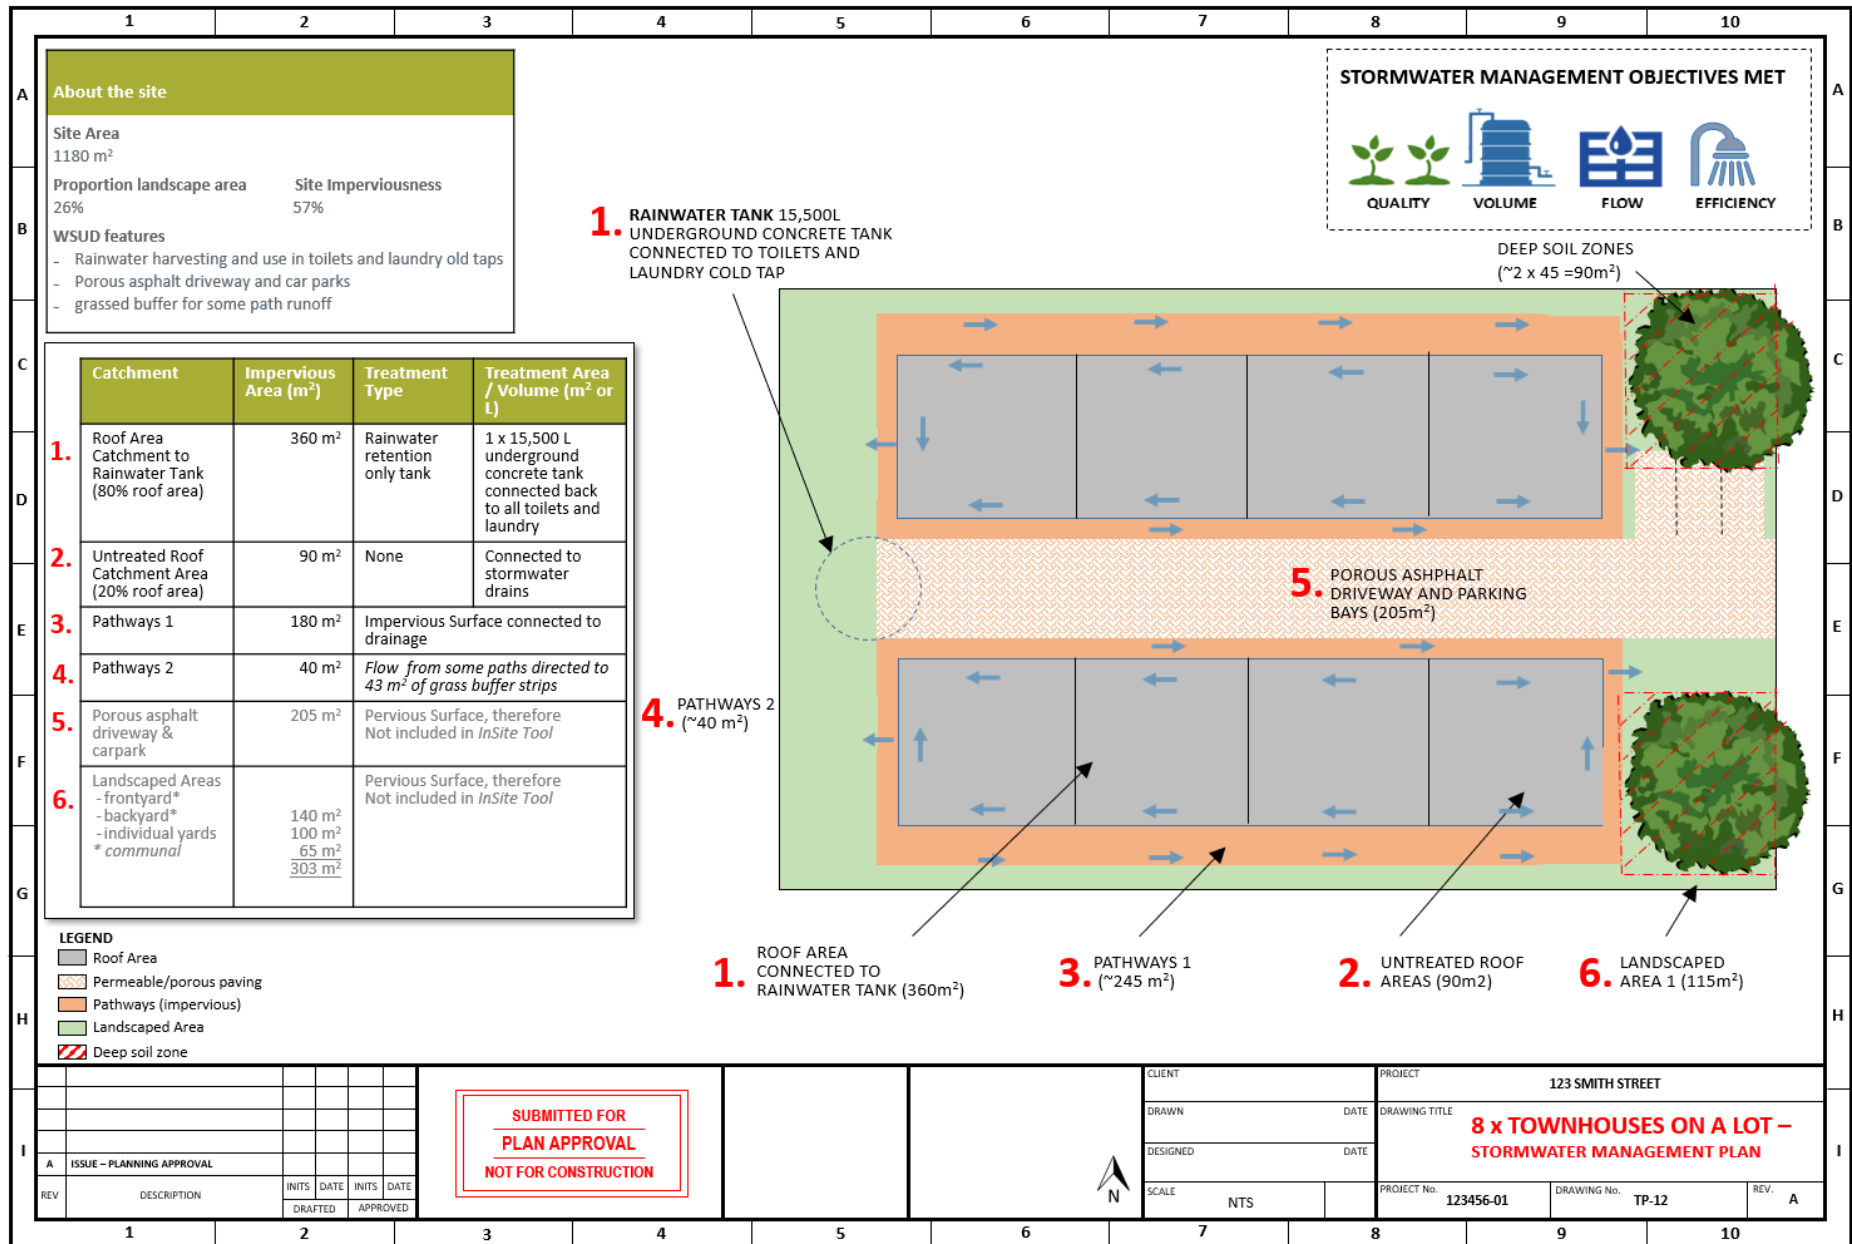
8 townhouses on a lot – this development has connected just over half of the roof area to a communal rainwater tank. In addition, the driveway is constructed of porous asphalt
